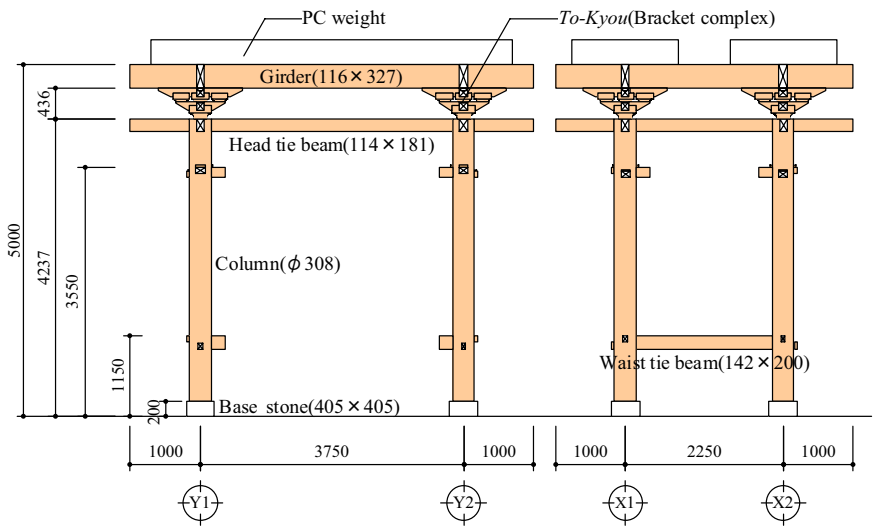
Wooden frame of simple frame (column-head tie beam) specimen (unit:mm)
